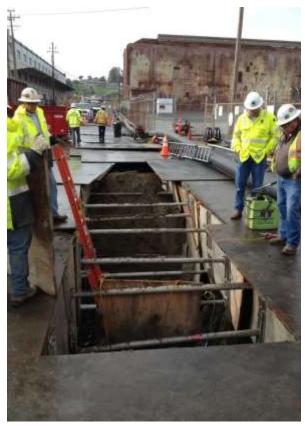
Potholing for underground duct bank south. View west, December 17, 2014.
